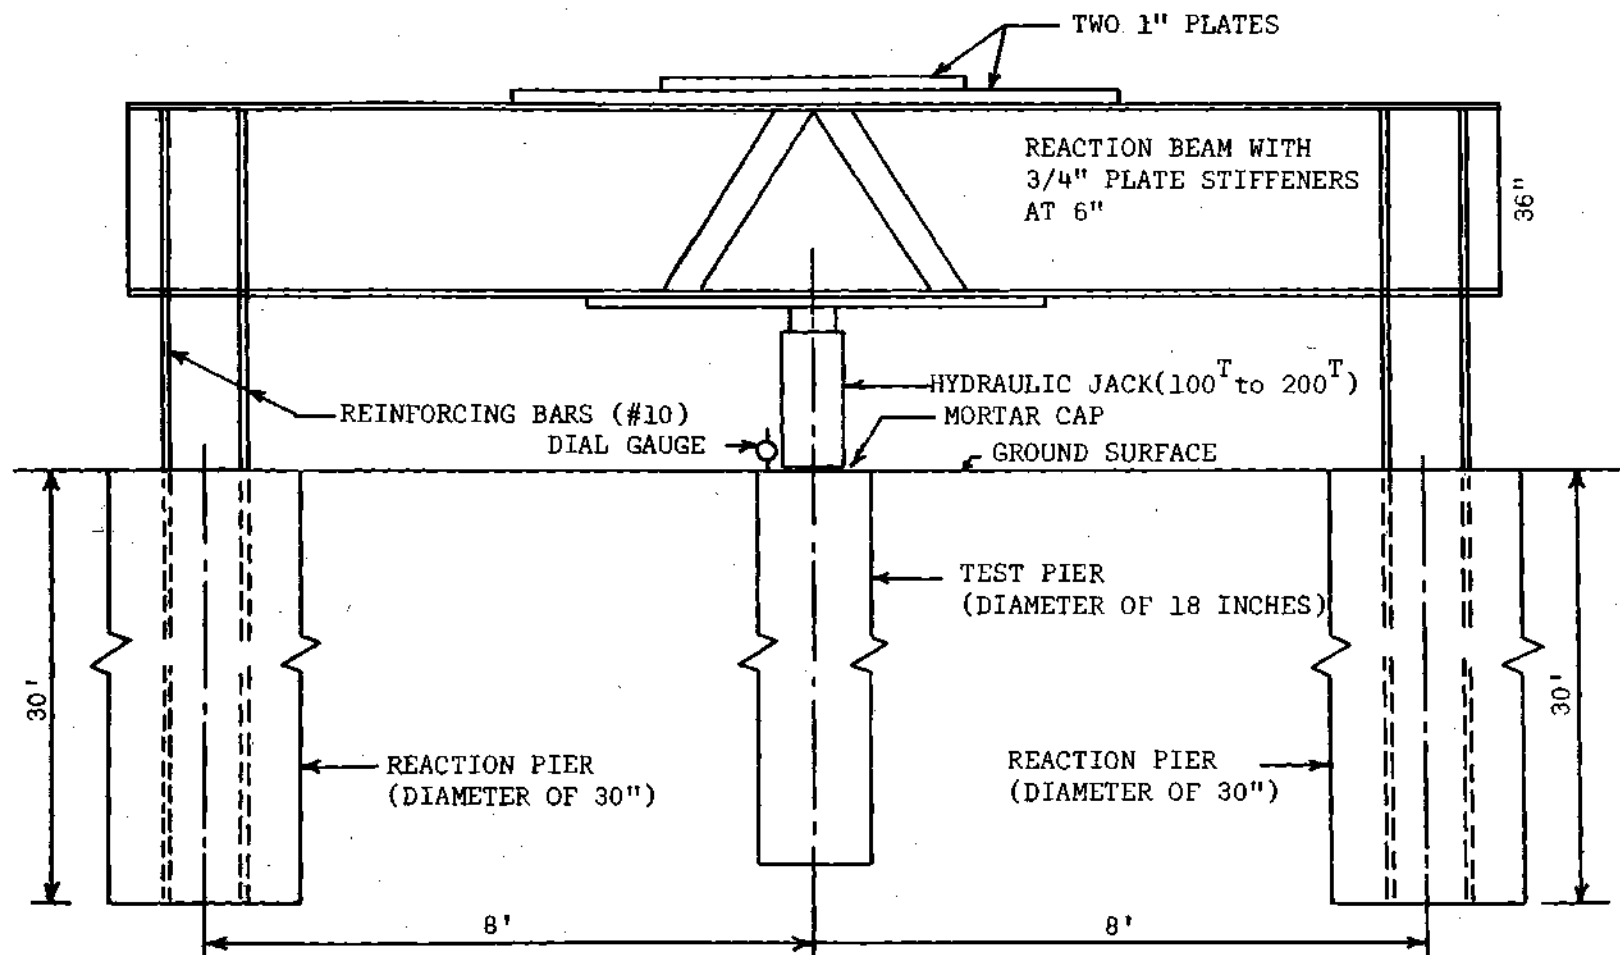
Load Frame and Test Apparatus for Test Piers One through Six
